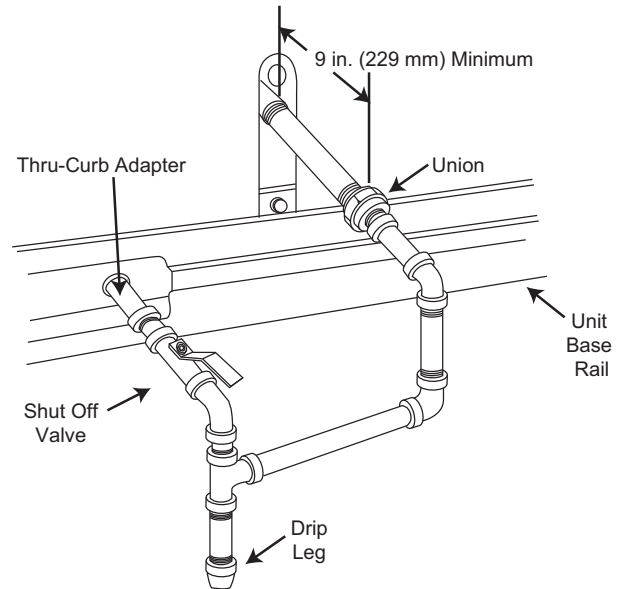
Gas Piping, Typical Curb Sidewall Piping (Example 1)
